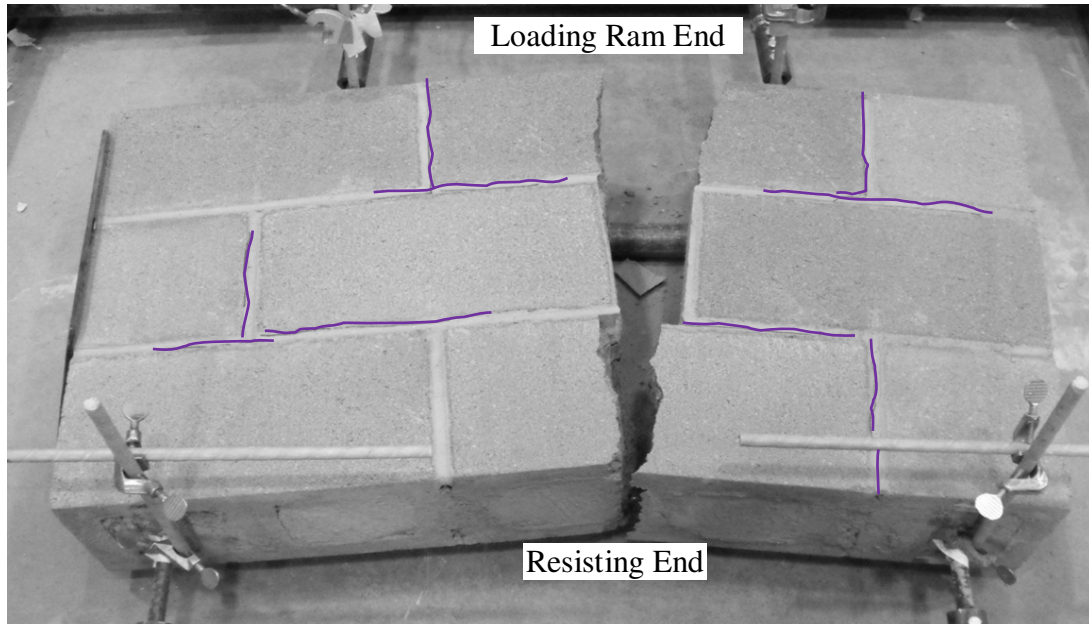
Typical splitting failure and surface crack pattern observed in a Phase-2 double pullout specimen with non-contact lap splices.
